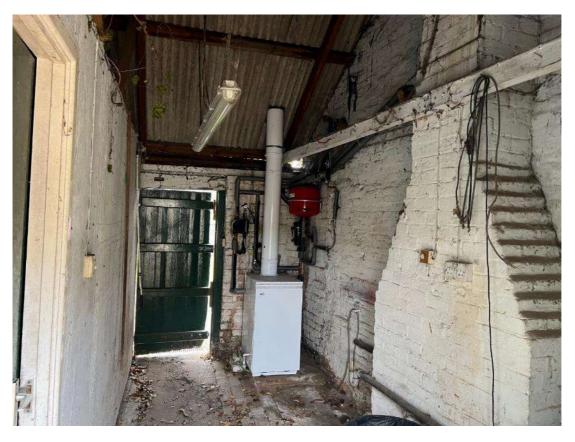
Building 4 (ref B4). Internal view, looking towards western access point. Shows no underlay material.
